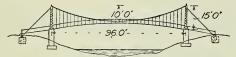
Outline of Suspension Bridge, 96 Ft. between Columns.
